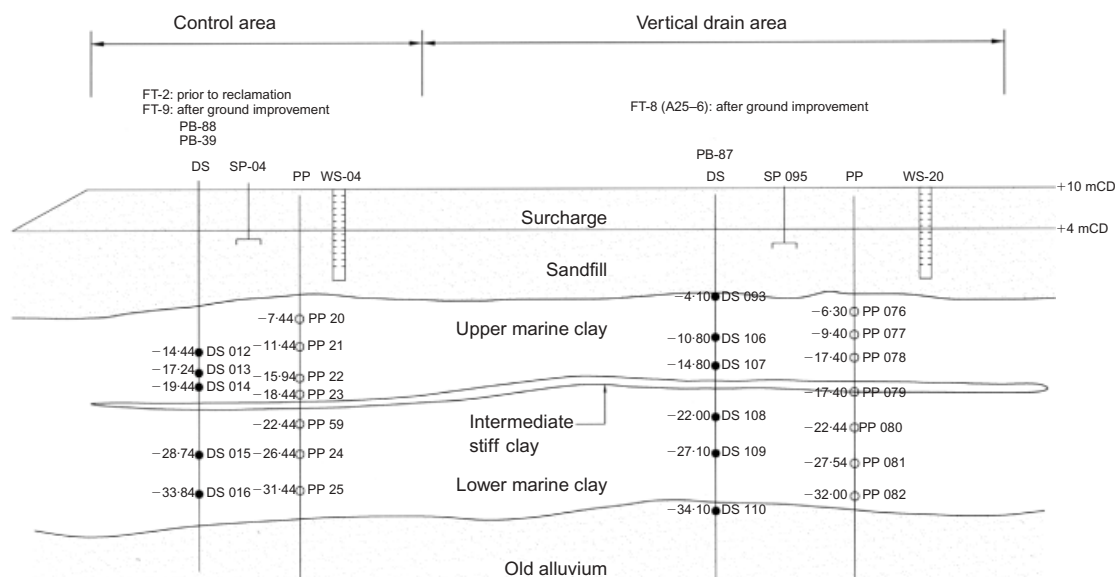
Cross-sectional soil profile showing instrument elevations at *in situ* test site. SP, settlement plate; DS, deep settlement gauge; PP, pneumatic piezometer; WS, water standpipe
